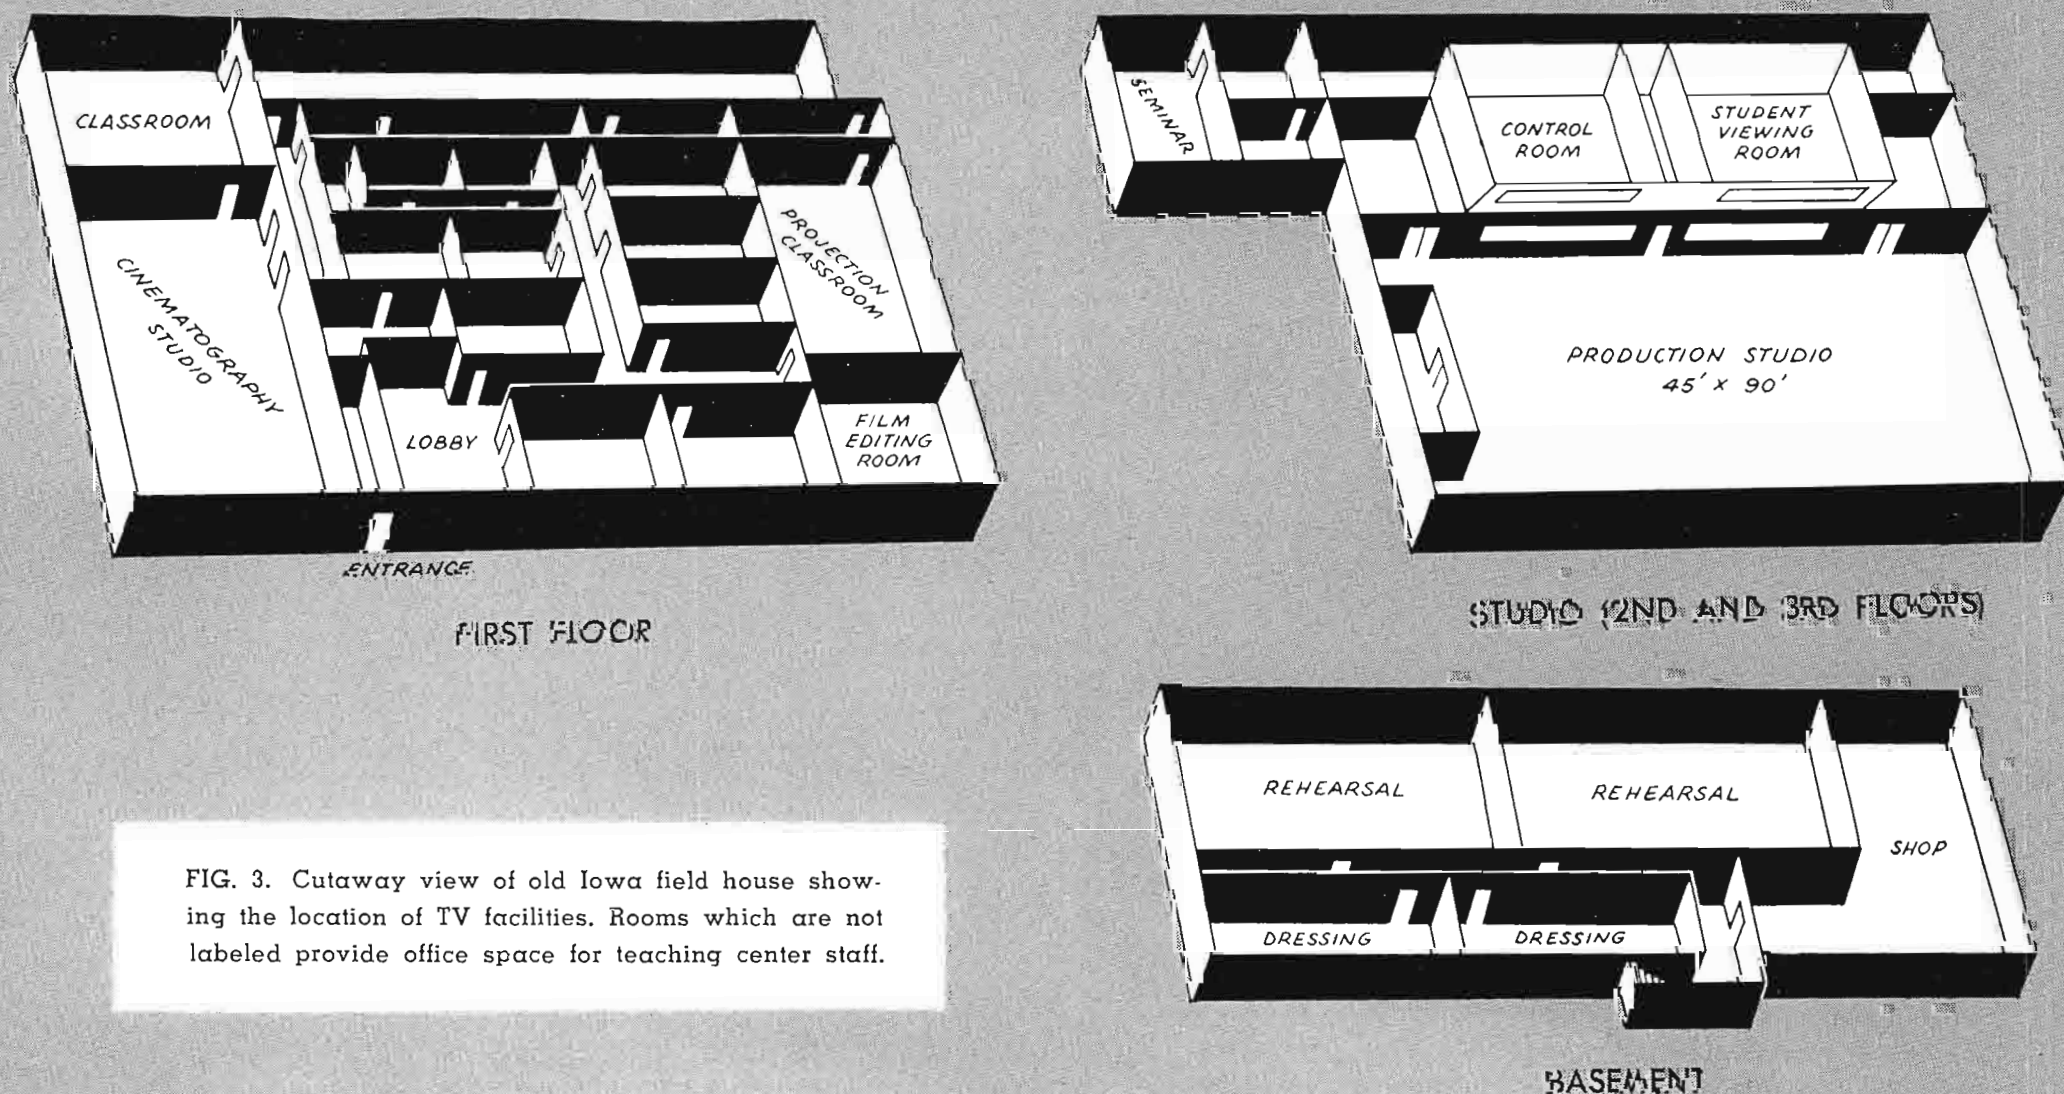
Cutaway view of old Iowa field house showing the location of TV facilities. Rooms which are not labeled provide office space for teaching center staff.
